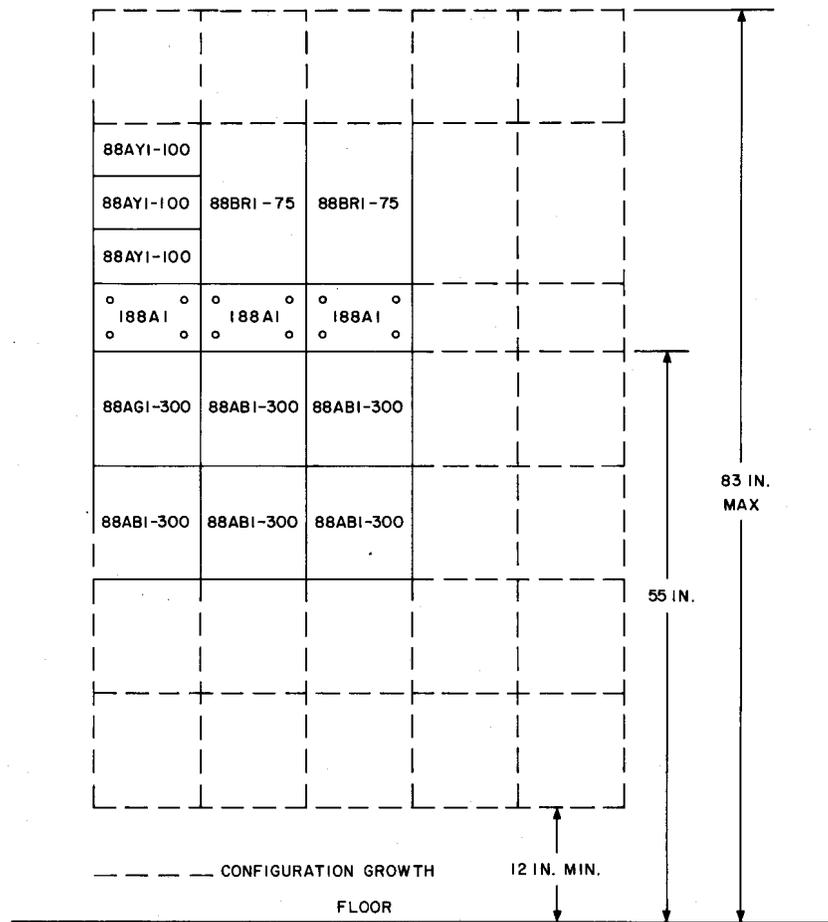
Basic Layout of Wiring Blocks in Riser Terminal
